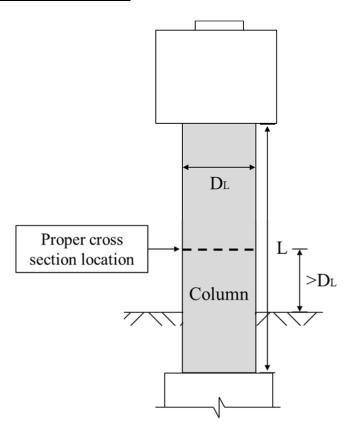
Proper temperature sensor cross section locations within a column (D_L = least dimension) (example of a horizontally oriented cross section)
